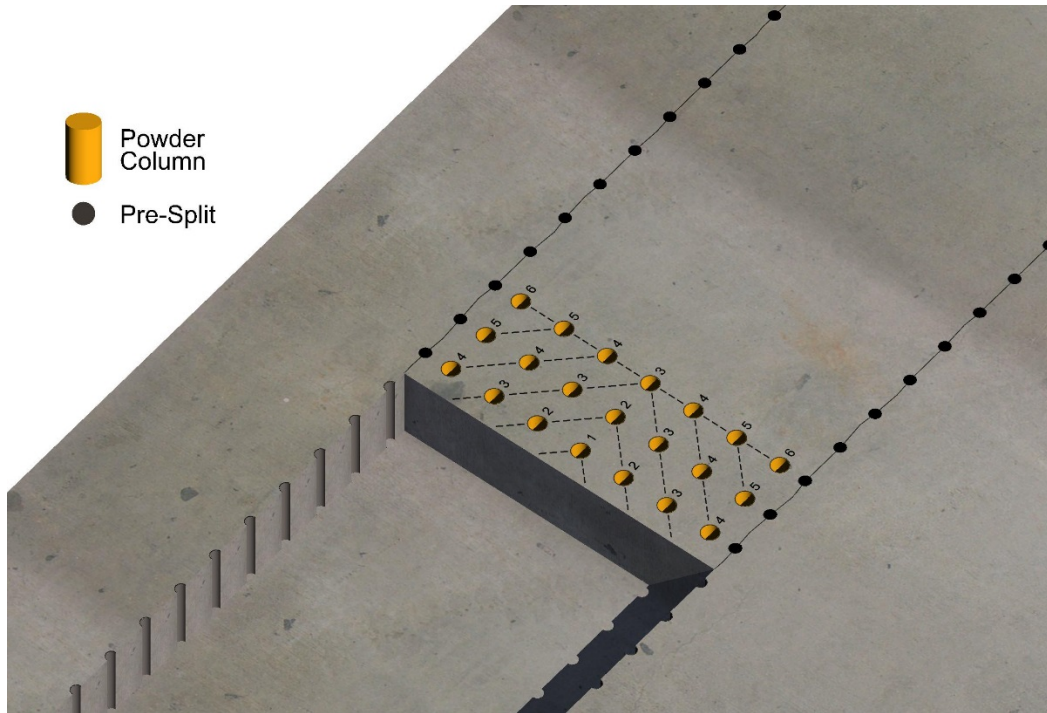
Typical Cut and Cover Blasting Pattern.
